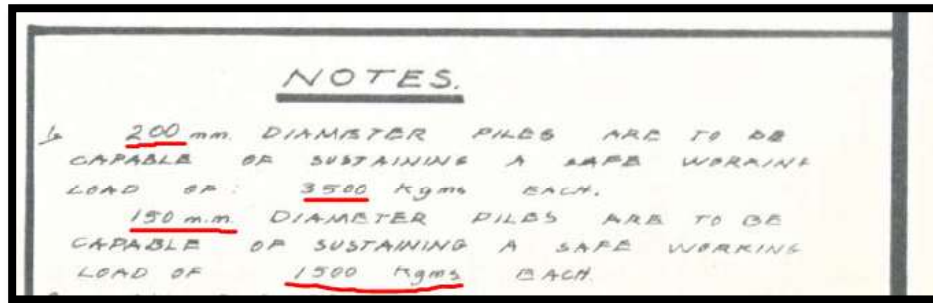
Structural Engineer's calculated forces applied by the 150mm & 200mm Diameter piles – taken from the engineers' drawings – Appendix B
